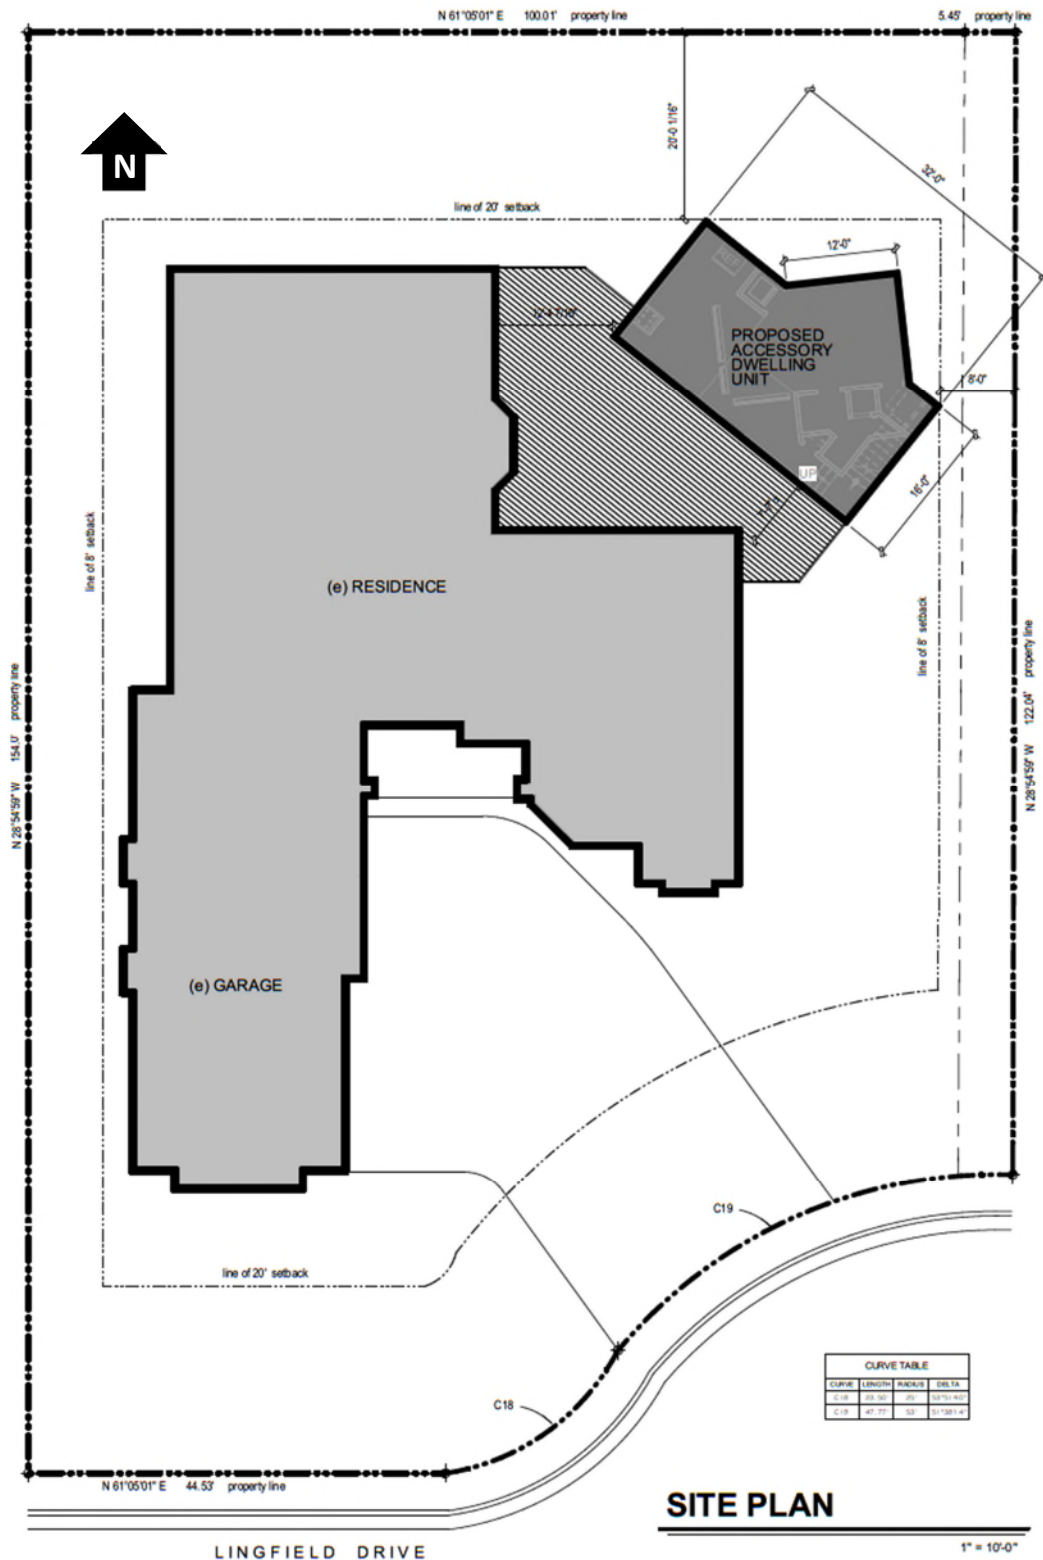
Detached Accessory Dwelling Proposed Site Plan
